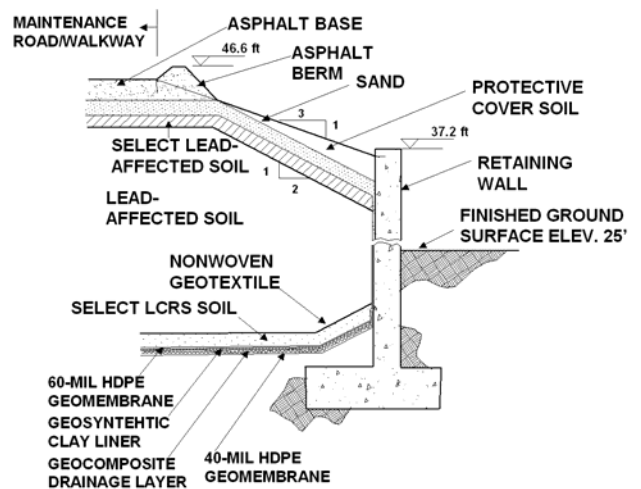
Cross-section of waste containment berm showing retaining wall where embankment width is limited by site restrictions. Details of the liner and cover systems are indicated.
